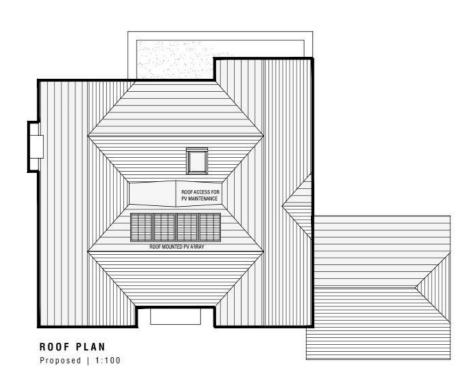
DRAWING 2410 302 Proposed Plans Plot 2 (Extract)
